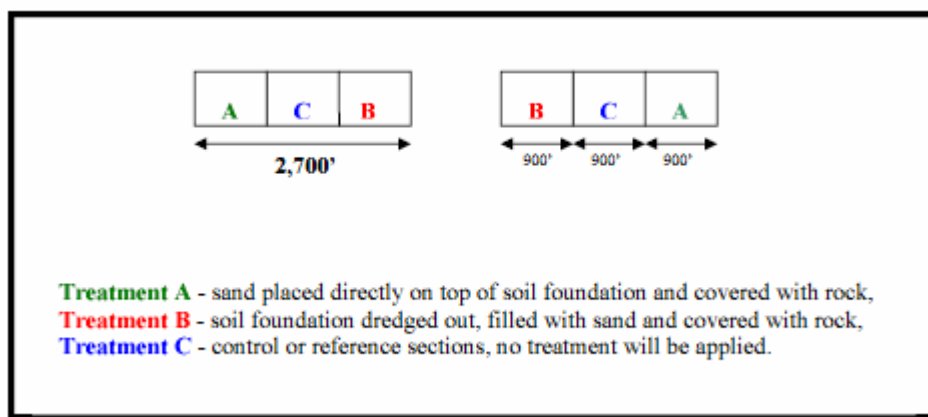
Experimental design layout of the Shoreline Protection Foundation Improvement Demonstration (LA-06) project (Stead 2004).
